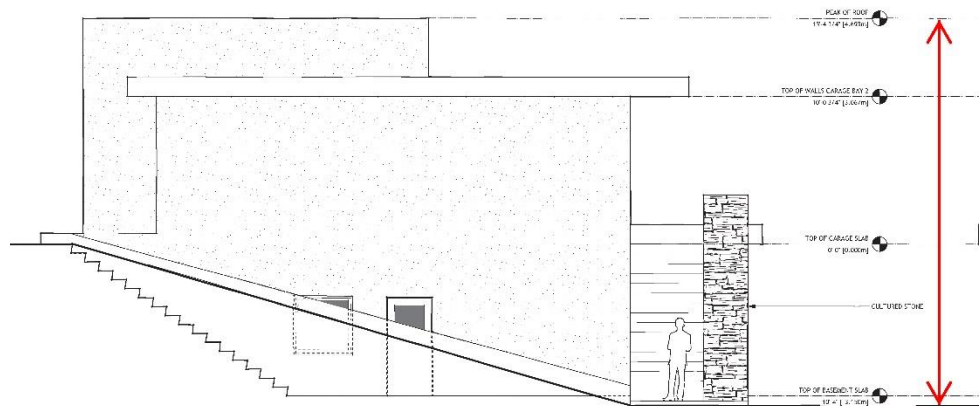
Cross Section of Proposed Carriage House showing where the 8.05m height measurement is taken; on the walkout side.
